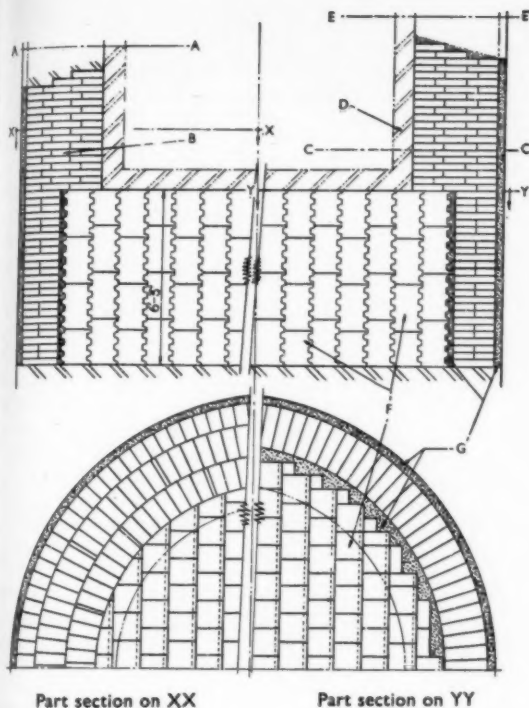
Typical hearth bottom and wall construction using corrugated carbon hearth blocks and normal wall shapes.
